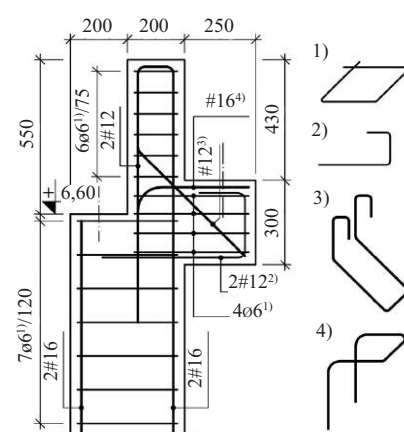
The geometry and reinforcement of the column's head: 1) two-legged stirrup; 2) contour reinforcement; 3), 4) loop consisting of two rebars
